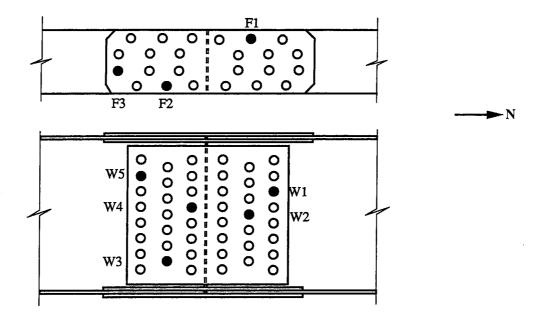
(c) Location of sampled bolts in connection N4 of bridge B2
